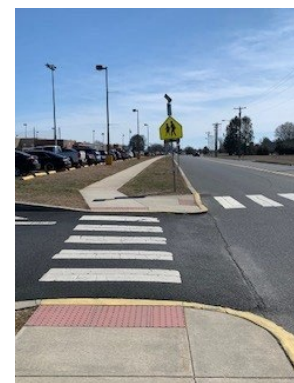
Frontage Sidewalk and Cross-Walk at Caesar Rodney High School
